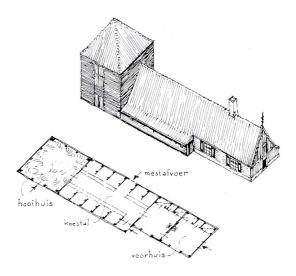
Isometric projection and ground-floor plan (Hooihuisboerderij, n.d.).
